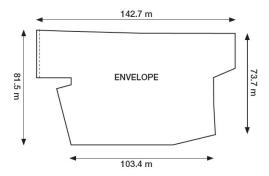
Block B site boundary Source: Woods Bagot & SOM architects
